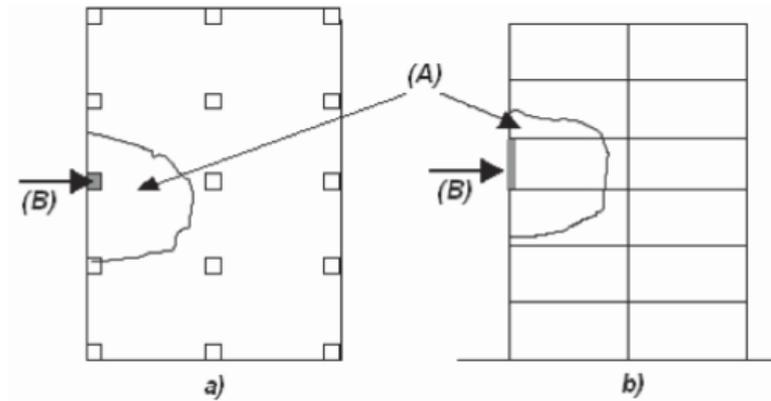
Acceptable limit of damage in case of removal of a column in a framed structure. The limit 'A' is 15 % of the floor area, or 100 m<sup>2</sup>, whichever is smaller, in each of two adjacent storeys. 'B' is the column notionally removed. A) Plan and b) Section (EN 1991-1-7, 2006)
